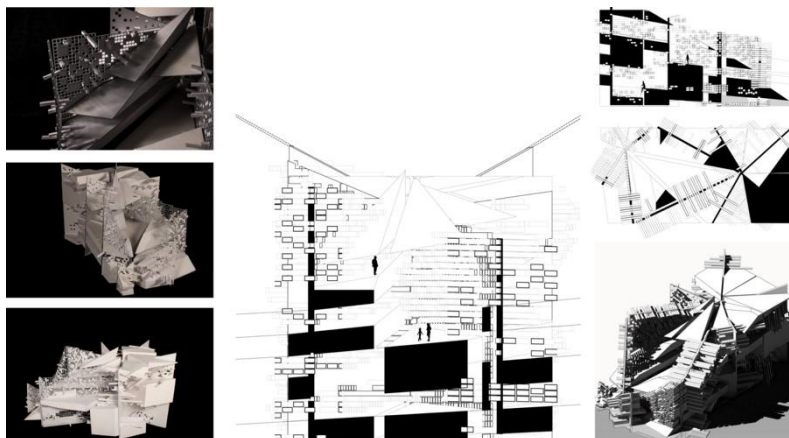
Pavilion Project in Architectural Design Studio 2 - Plan Section and and model of Pavilion.
